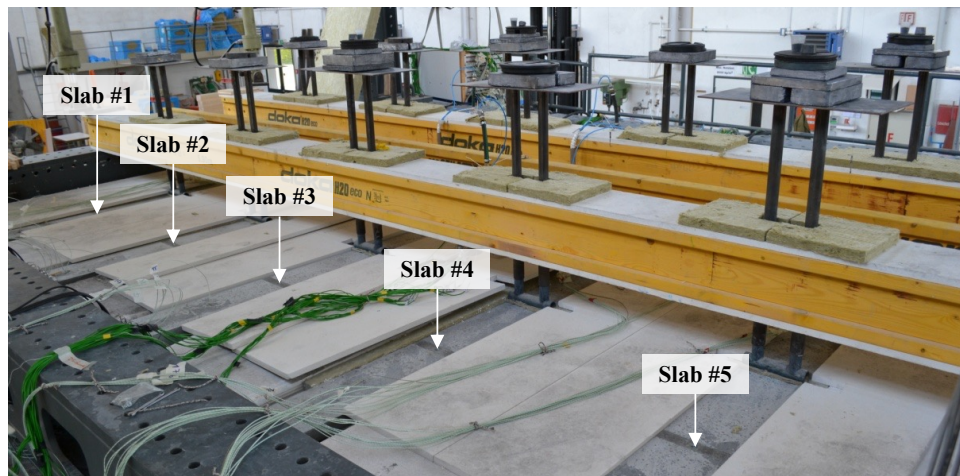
Photo of the fire resistance test setup showing the positions of the large-scale specimens on the top of the fire testing furnace (spaces between the test specimens were filled-in with insulating boards).
